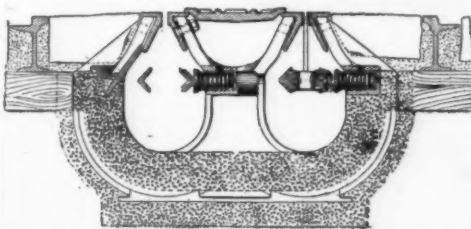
ELECTRIC RAILWAY CONDUIT FOR DOUBLE TRACK ROAD.
